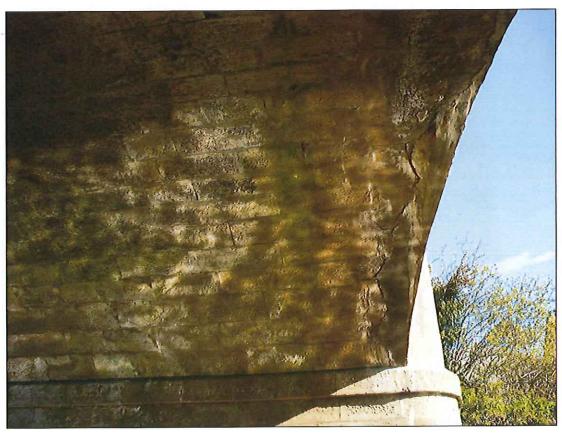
Concrete widening #3 to eastern downstream side of south span. Note extensive circumferential cracking.
